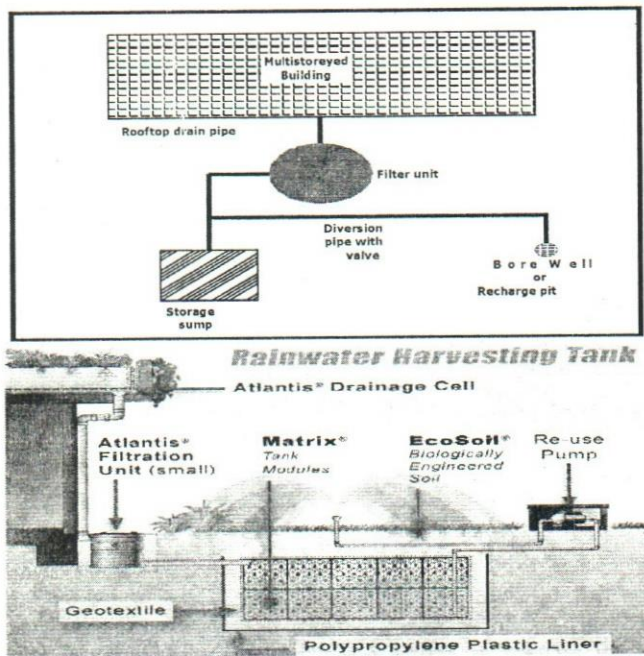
Rainwater harvesting arrangement in a multistoried building as advocated by the HMWSSB, Andhra Pradesh
